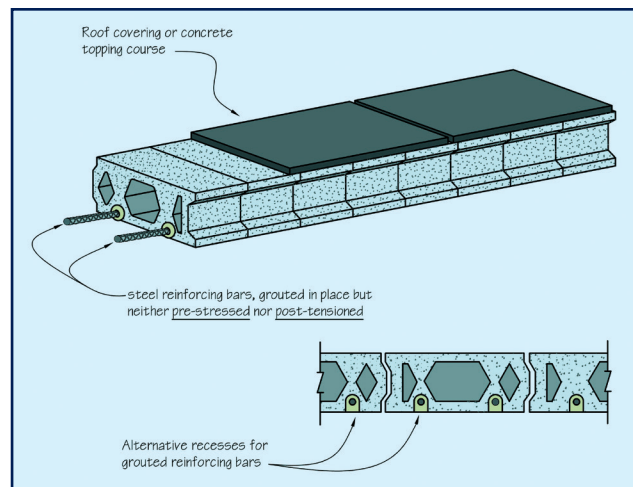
Instead of seven-strand cable, ordinary rebar was used, so this manufacturing procedure was not as effective as modern pre-stressing or post-tensioning techniques; consequently, design tables for modern pre-stressed concrete product should not be used to analyze this type of roof deck.
